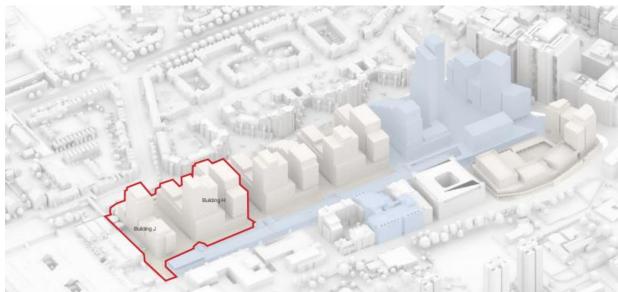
Site (outlined in red) in relation to locality including buildings consented in detail (in blue) of the wider London Dock development (east to left of image, north to bottom of image)
